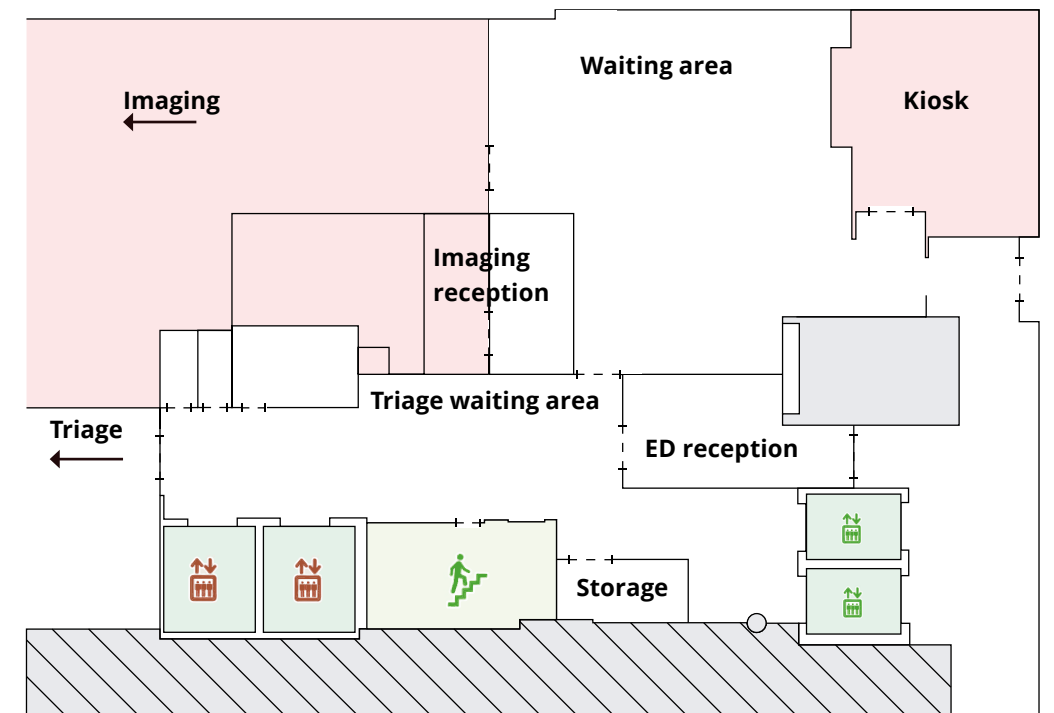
Plan drawing of alternate layout of the St. Olavs reception
